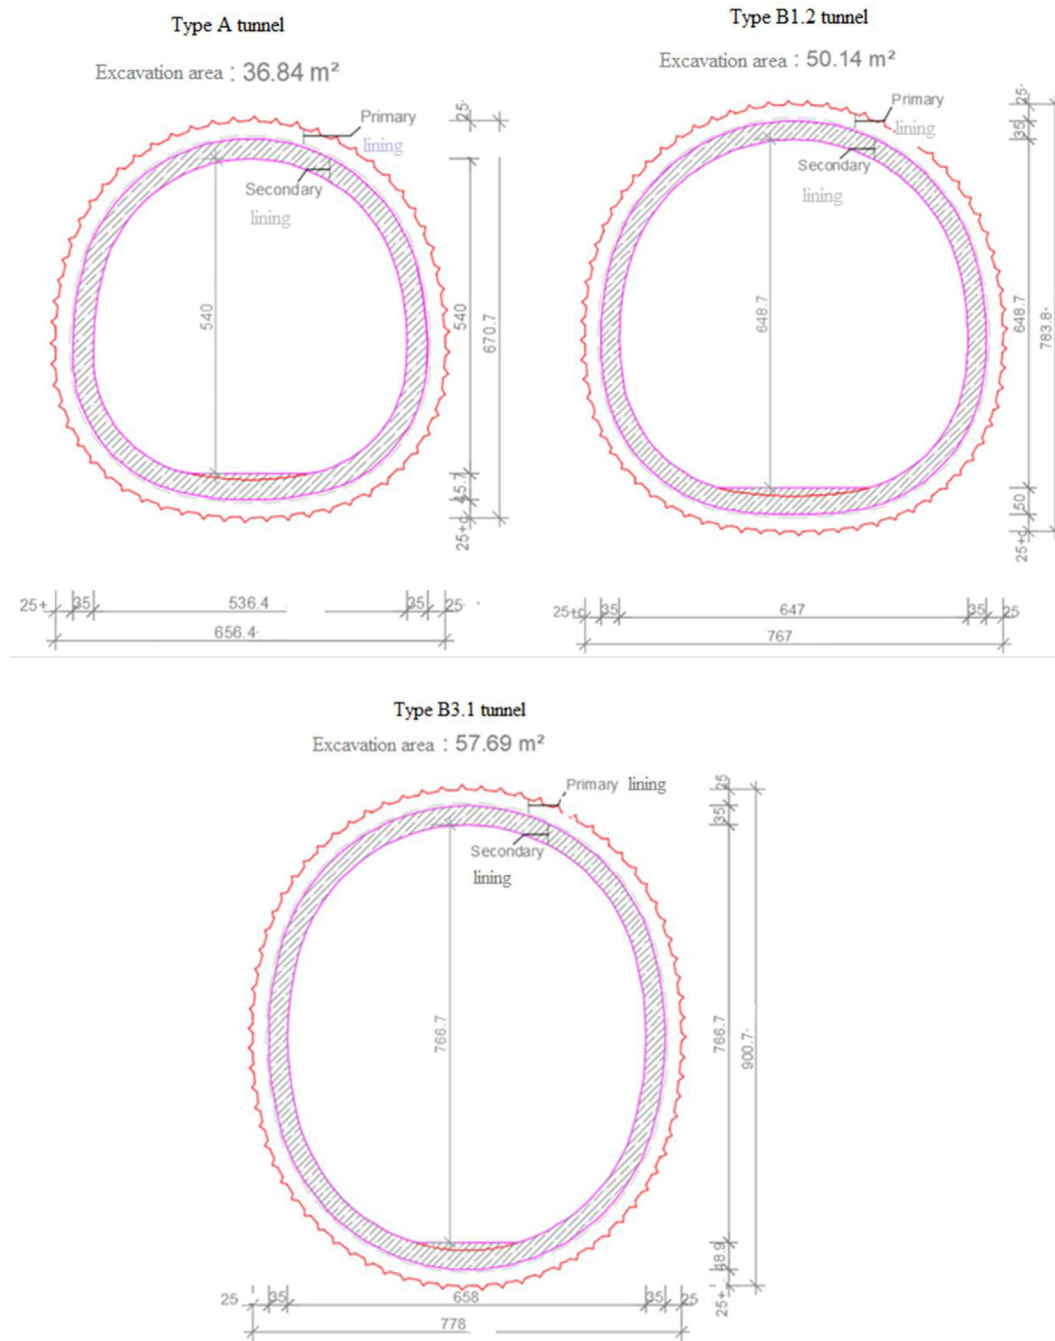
Cross section of Type A, B1.2, and B3.1 tunnels (Unit: cm) (IMM, 2013).
